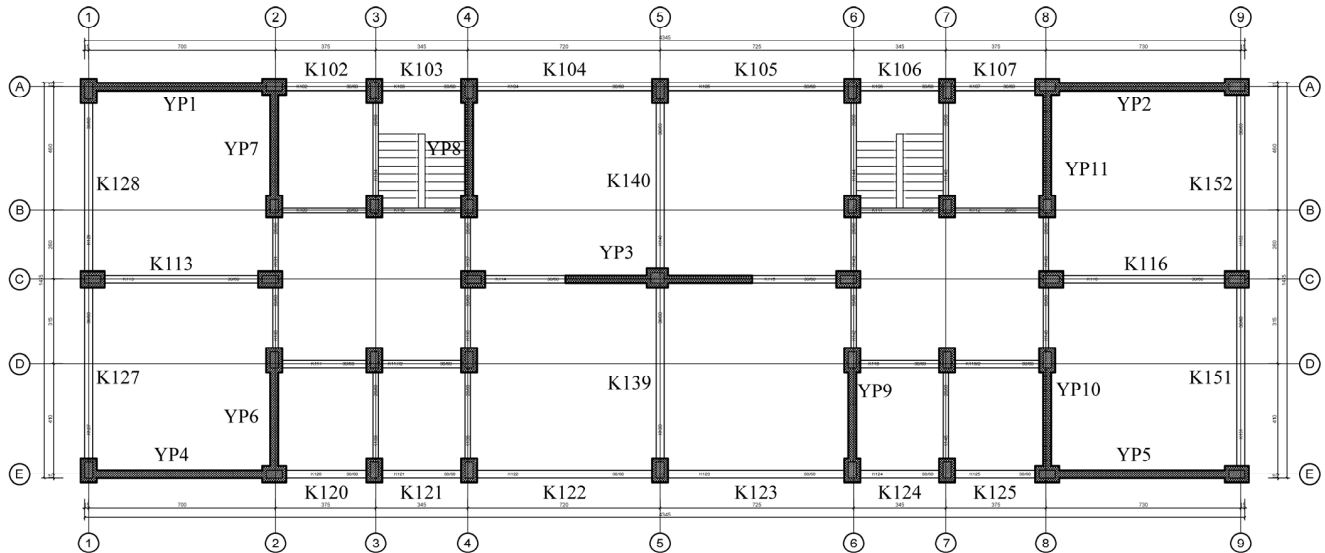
The structural layout of the +3.20 level slab, featuring jacketed columns and added shear walls for strengthening between frame columns.
